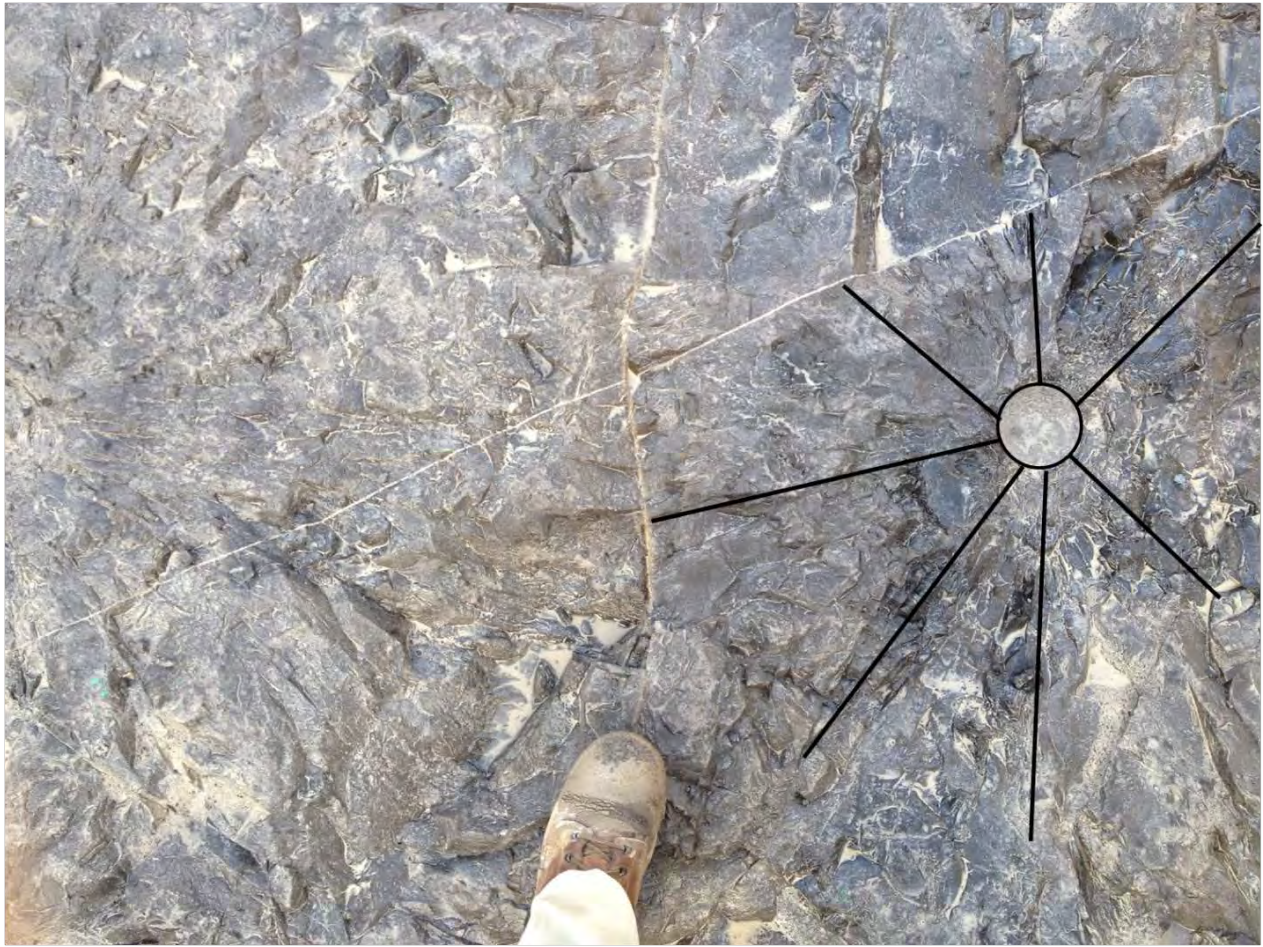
Radial Fracturing in the Subdrill Due to Blasting.
